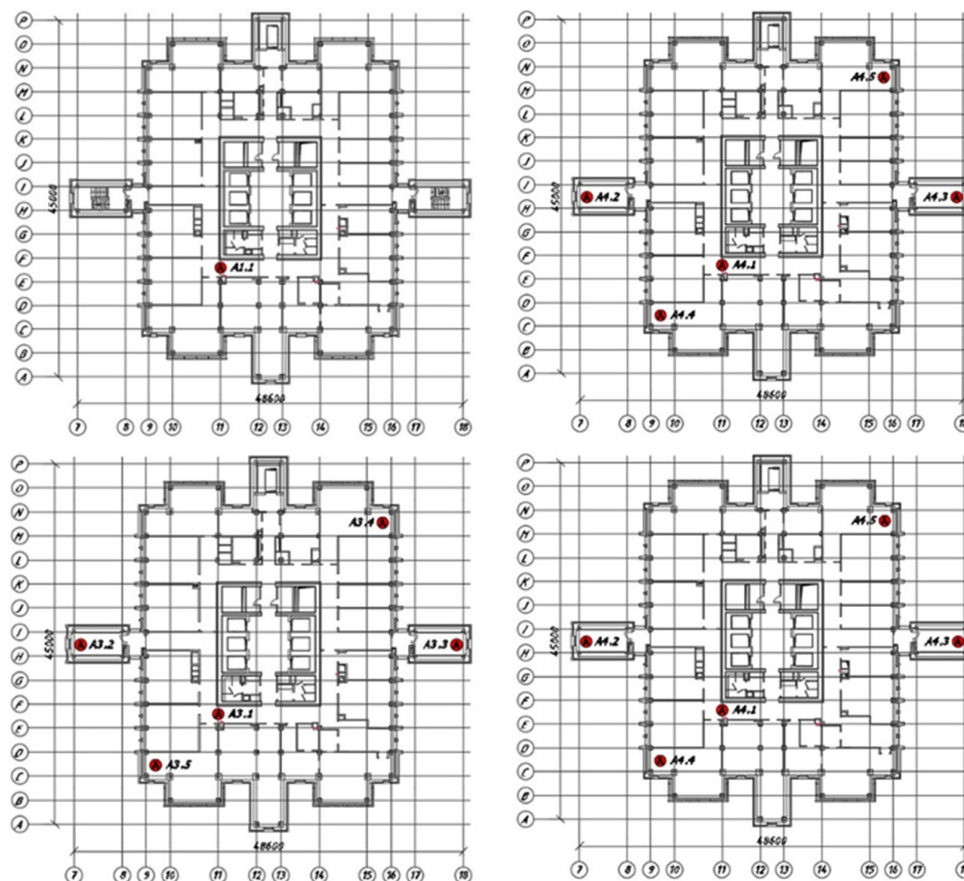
Location of accelerometers for the frame-bond frame with a monolithic reinforced concrete core stiffness 7, 13, 20, 26 floors
